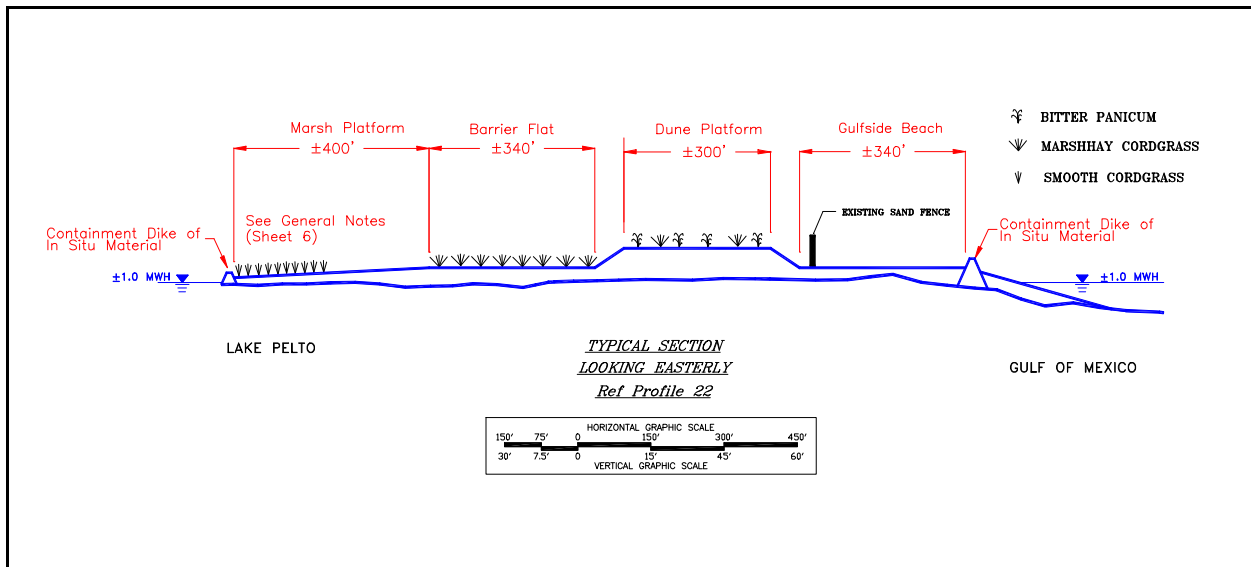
Typical vegetative design cross-section of the New Cut Dune/Marsh Restoration (TE-37) project.
